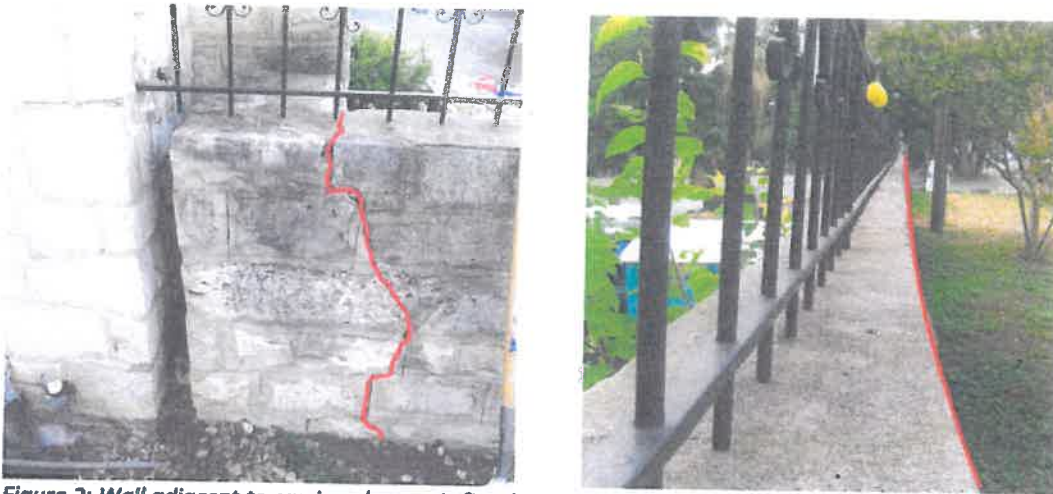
Wall adjacent to carriage house; Left, minor cracking on inside face on north end of wall (highlighted). Right, minimal outward lean at center of wall (lean of wall highlighted).
